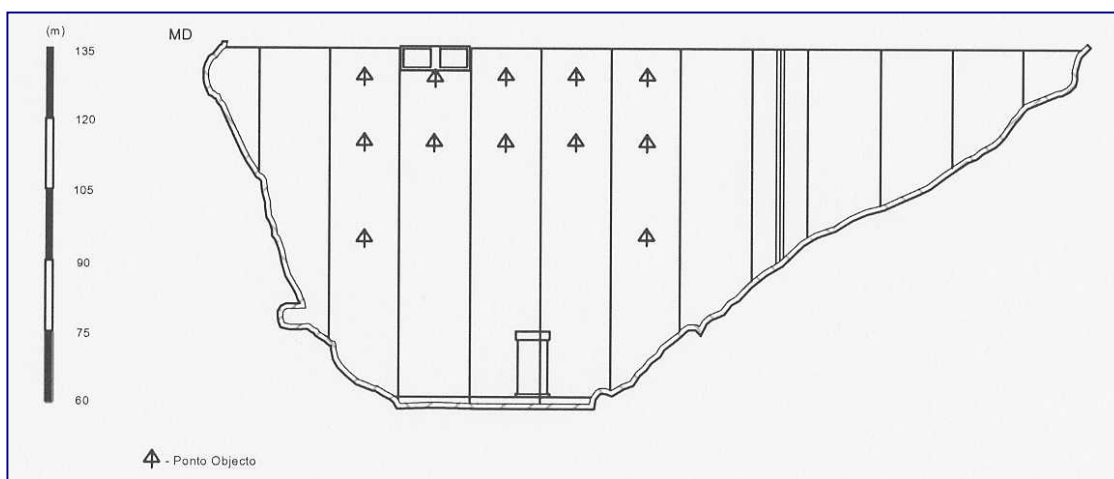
Object points on the downstream wall of Santa Luzia dam.
